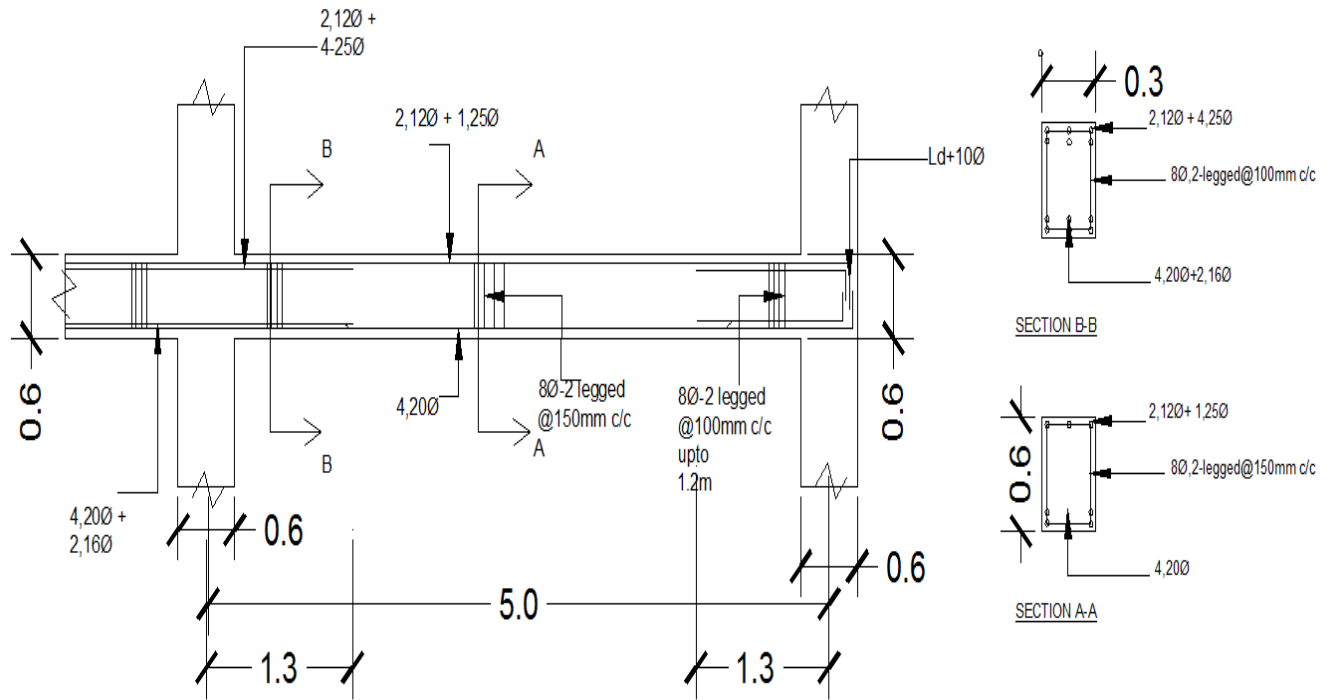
reinforcement detailing for an interior beam of G8ZV
